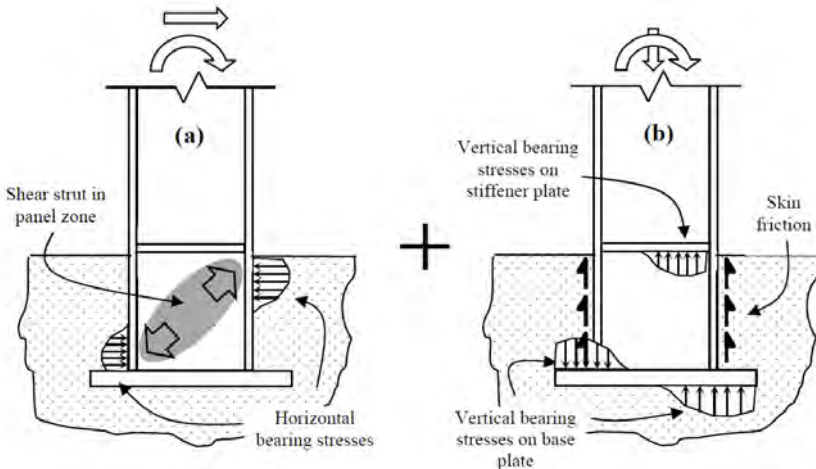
Force resisting mechanisms (a) horizontal bearing and panel zone strut (b) vertical bearing and skin friction
